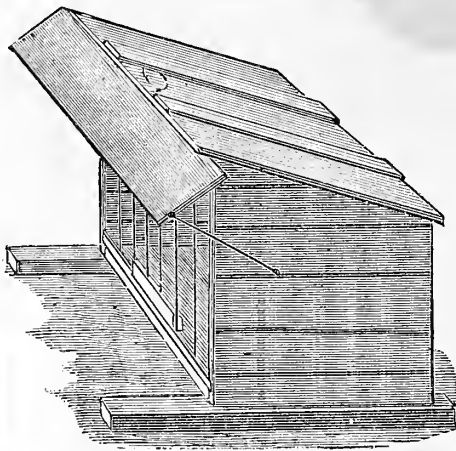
COOP COMPLETED, WITH SHELTER BOARD.
